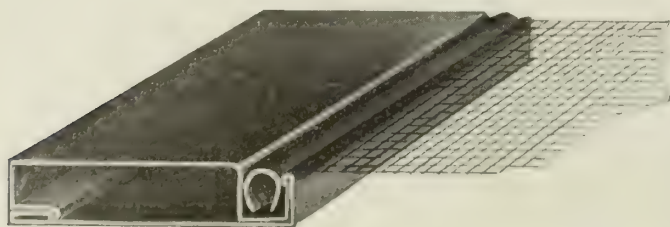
SECTION THROUGH STILE OF LIGHT METAL FRAME DOOR
